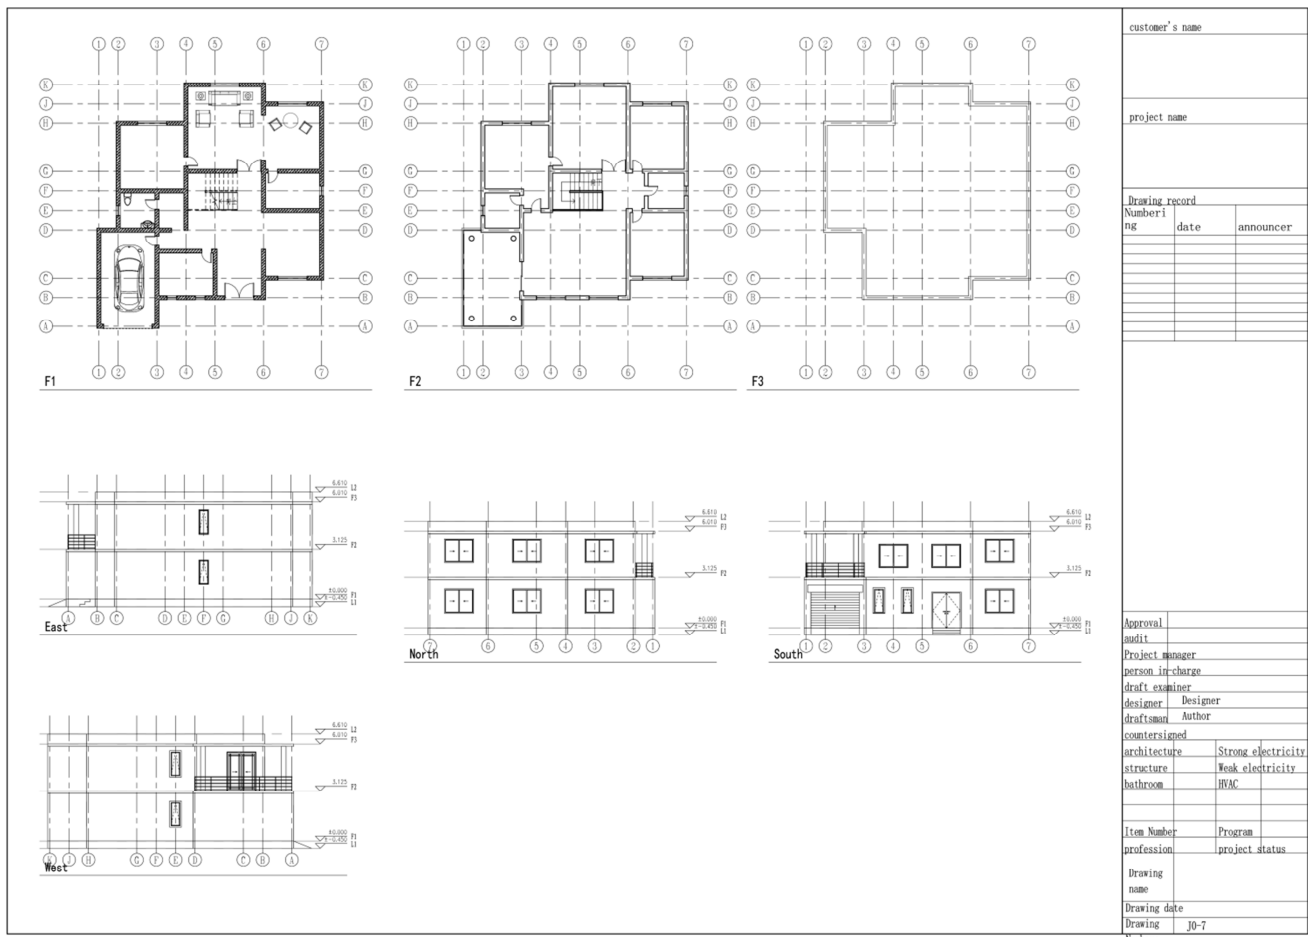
The initial student's usual homework: Integrate the Revit building plan, elevation and door and window statistics on the A3 drawing.
